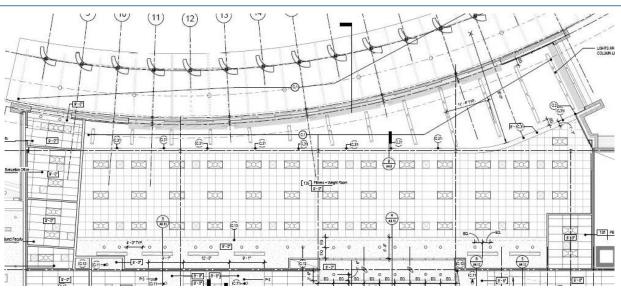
Fitness and Weight Room Reflected Ceiling Plan
